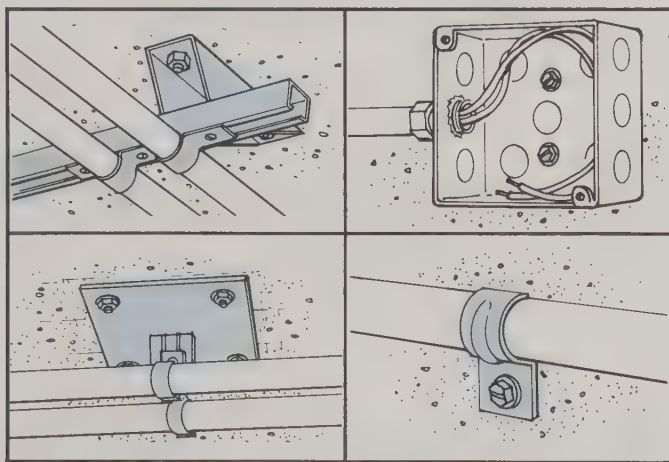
Masonry anchors are used to fasten brackets, junction boxes, and conduit clamps to masonry walls. (ITW Ramset)
